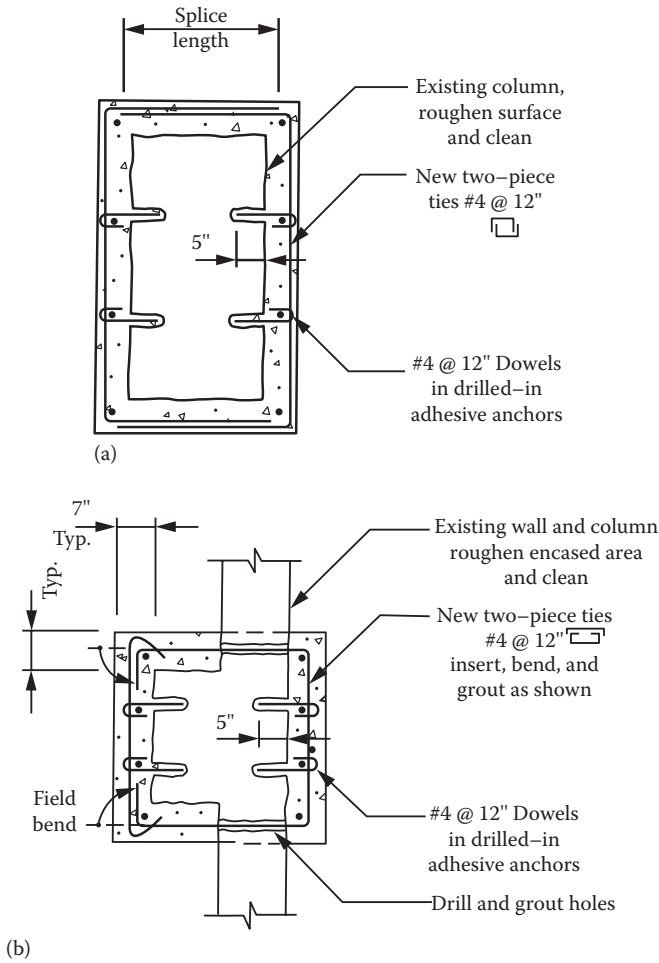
Strengthening concrete columns by section enlargement. (a) Interior isolated column; (b) exterior column forming part of a wall.
